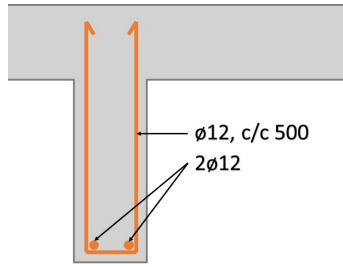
Beam reinforcement layout. Note that there are changes in c/c spacing near pier 4 and 5 to 150 mm
